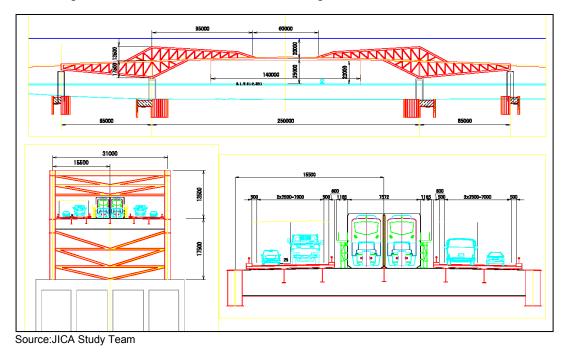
Main Bridge Design by High Strength Boltless Steel Truss with Steel Box Girder
